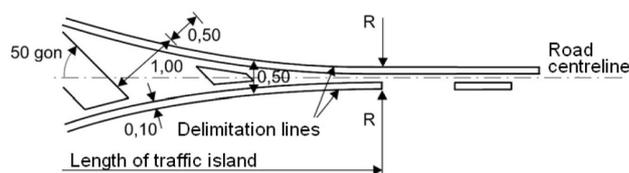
The connection between the reservation area and the road markings [2]
